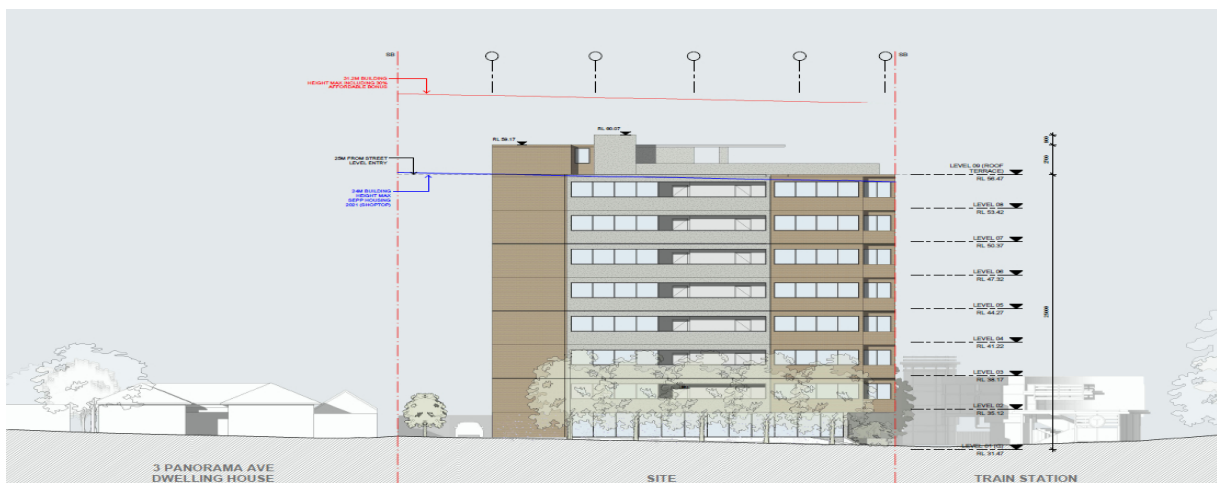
View from the south- proposed concept next to the existing 1 storey dwelling to the left and Woollooware statin behind the building (Source: Stanisic Architect, 2025)
